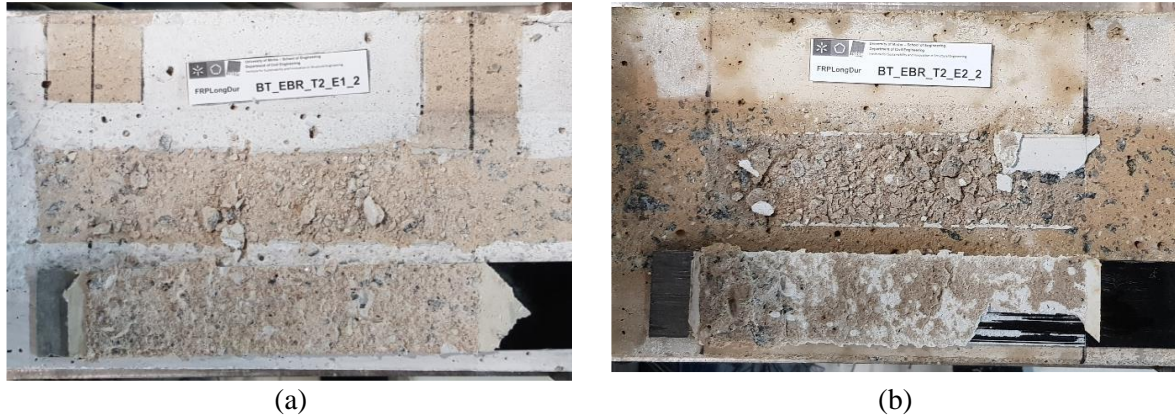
Typical observed failure modes in bond EBR tests: (a) cohesive failure of concrete – C and (b) cohesive failure of concrete and debonding at laminate-adhesive interface - C + F/A.
